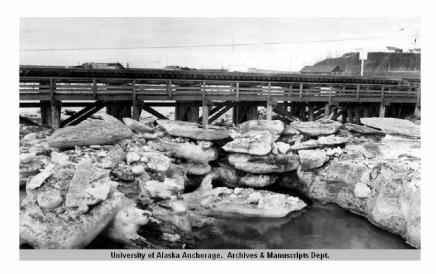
Ice Dam at Railroad Crossing, Ship Creek, 1942.
